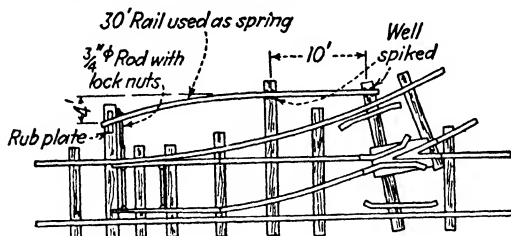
Spring switch, with a cantilevered rail acting as the spring.
